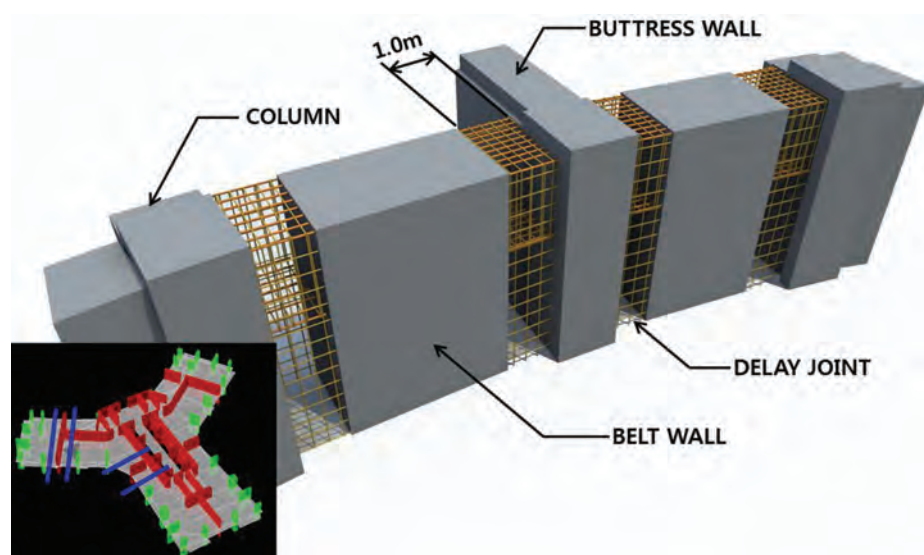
Delay joint of the tower belt-wall (Source: DongYang)
